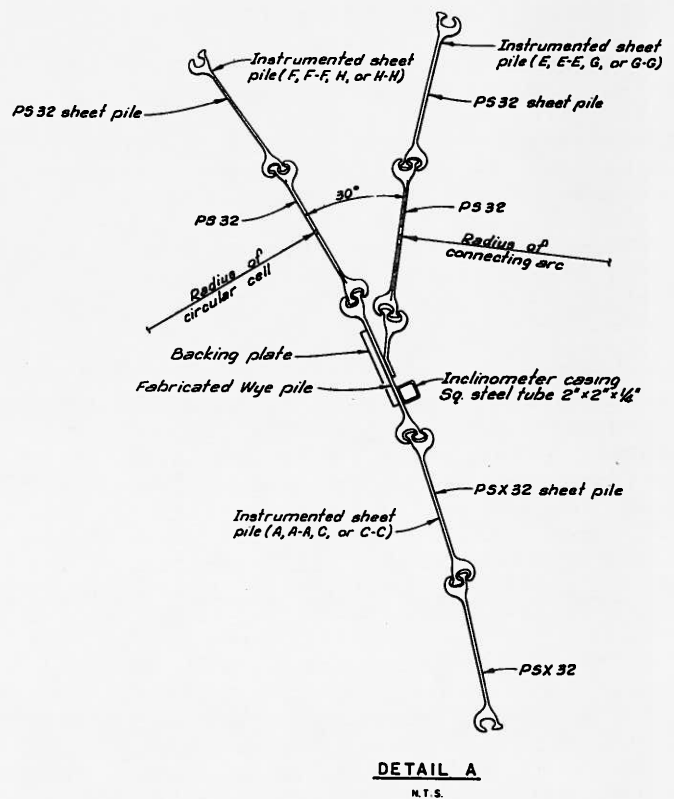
PLAN OF INSTRUMENTED CIRCULAR CELLS AND CONNECTING ARCS
